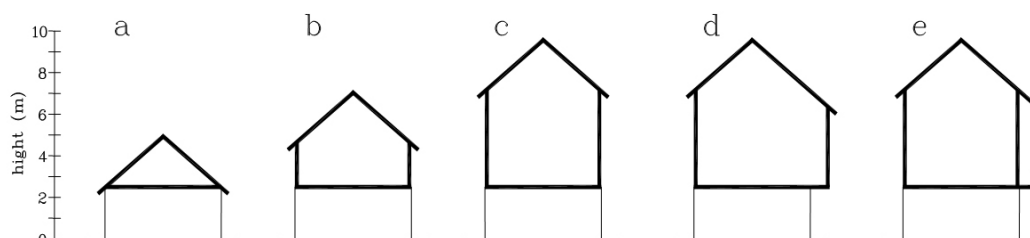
Increase in the height of farm buildings: a – a building with a utility attic before 1950; b – a building with a low knee wall; c – a building with a high knee wall; d – a building with a high knee wall and an overhanging attic; e – a building with a gallery
